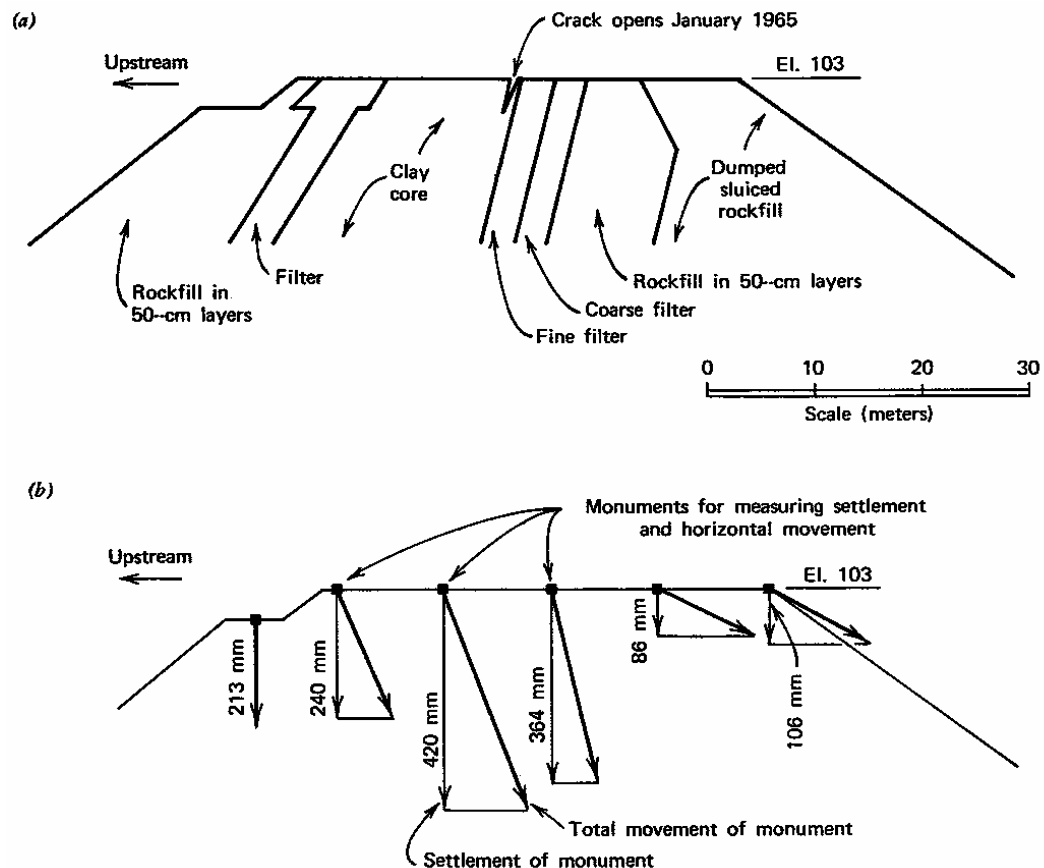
Djabatulur dam; (a) location of crack observed during construction, January 1965; and (b) deformation of monuments at elevation 103 m, January to April 1965 (Sherard 1973).
